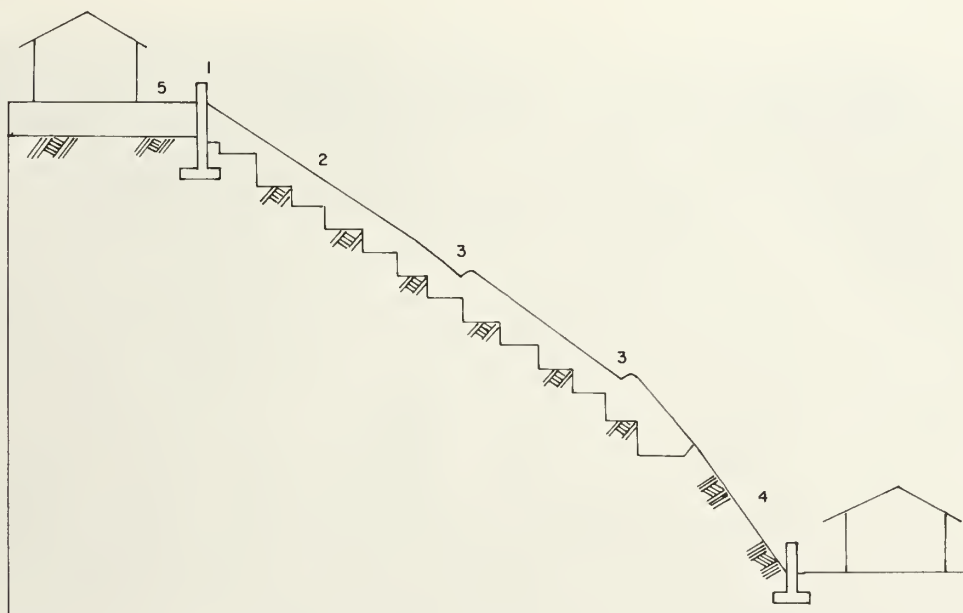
Diagrammatic cross section illustrating alternative remedial measures utilizing engineered fill to stabilize slopes in residential areas of the Baldwin Hills: (1) construction of properly designed retaining wall and drainage devices (such as granular backfill and drain pipe behind the wall and weep holes in the wall); (2) loose soil and slide debris are removed, stabilization fill should then be properly keyed and benched into firm bedrock as shown, and adequate subdrains provided. For steep slopes, soil-cement fill may be desirable. (3) Gunite or concrete bench drains that divert water to discharge outlet are constructed. (4) Retaining or slough wall, with adequate freeboard and drainage devices, may be required at the toe of a cut slope, particularly if the slope material is poorly consolidated. (5) Surface water flow on building pad should be directed away from the slope to the street, and water should not be allowed to flow from the pad down the slope. (Not drawn to scale.)
